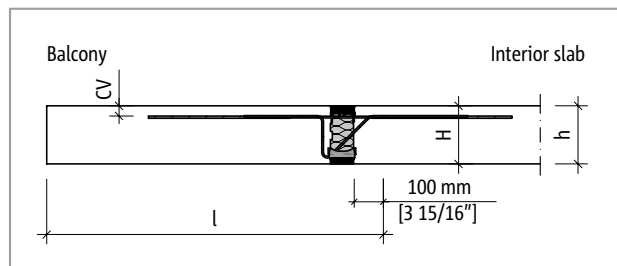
Schöck Isokorb® T Type CK: Structural system
